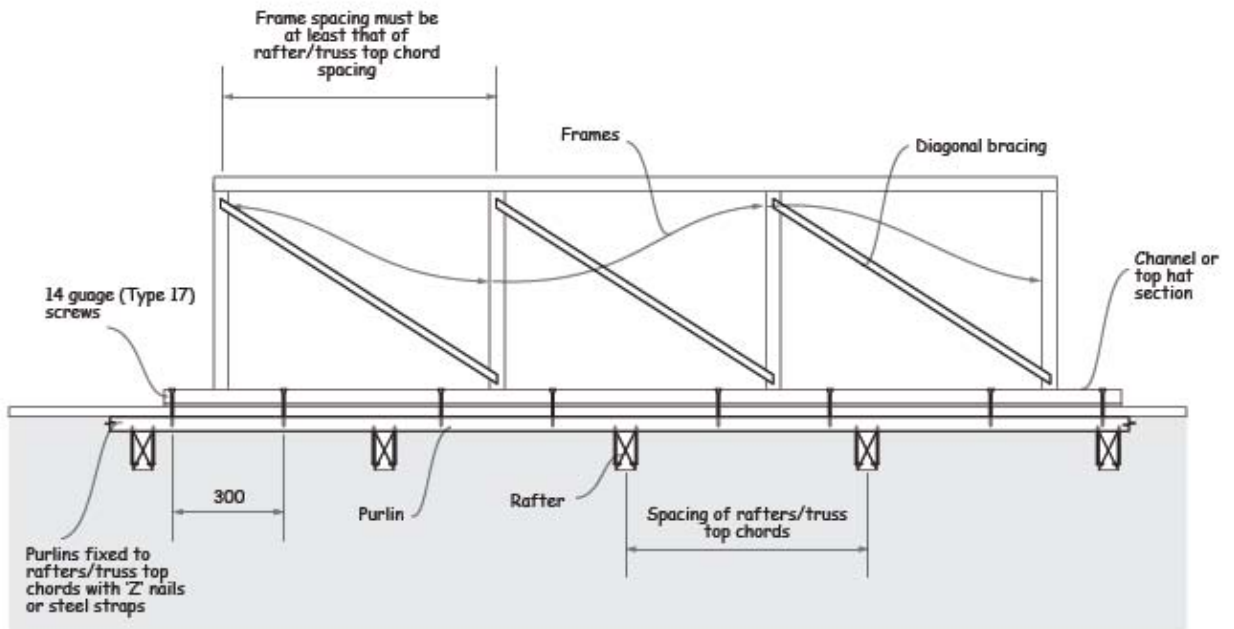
Solar collectors at a different pitch to the roof, supported using frames (elevation view)
